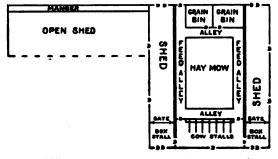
A SMALL CATTLE BARN (FLOOR PLAN).
